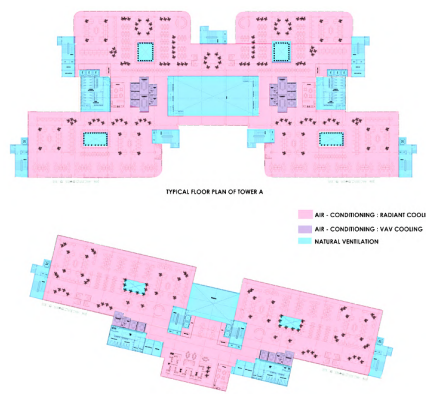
TYPICAL LAYOUT OF FLOOR CONDITIONING SYSTEM
